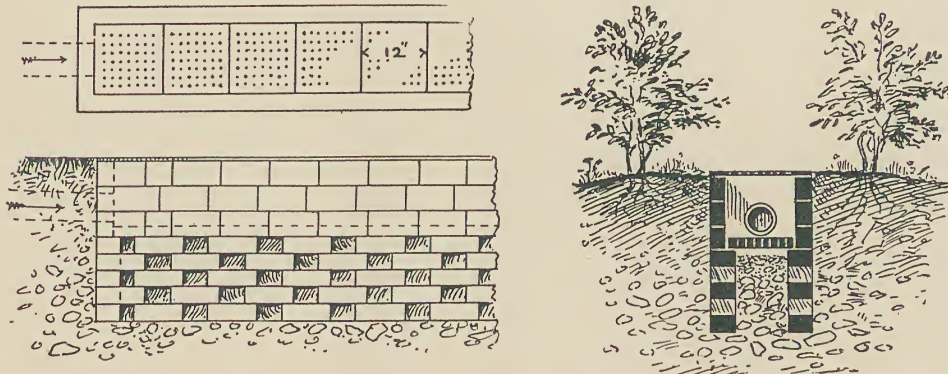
Plan, Section, and Elevation of Filtration-gutter.
